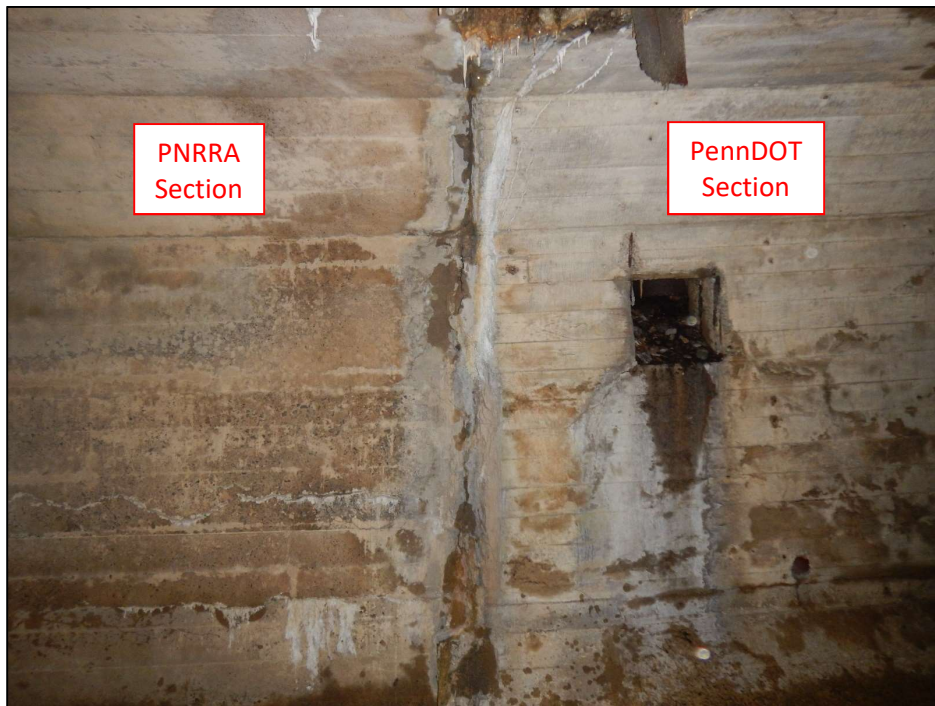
Span 1 south wall construction joint between the sections with active water seepage and efflorescence.
